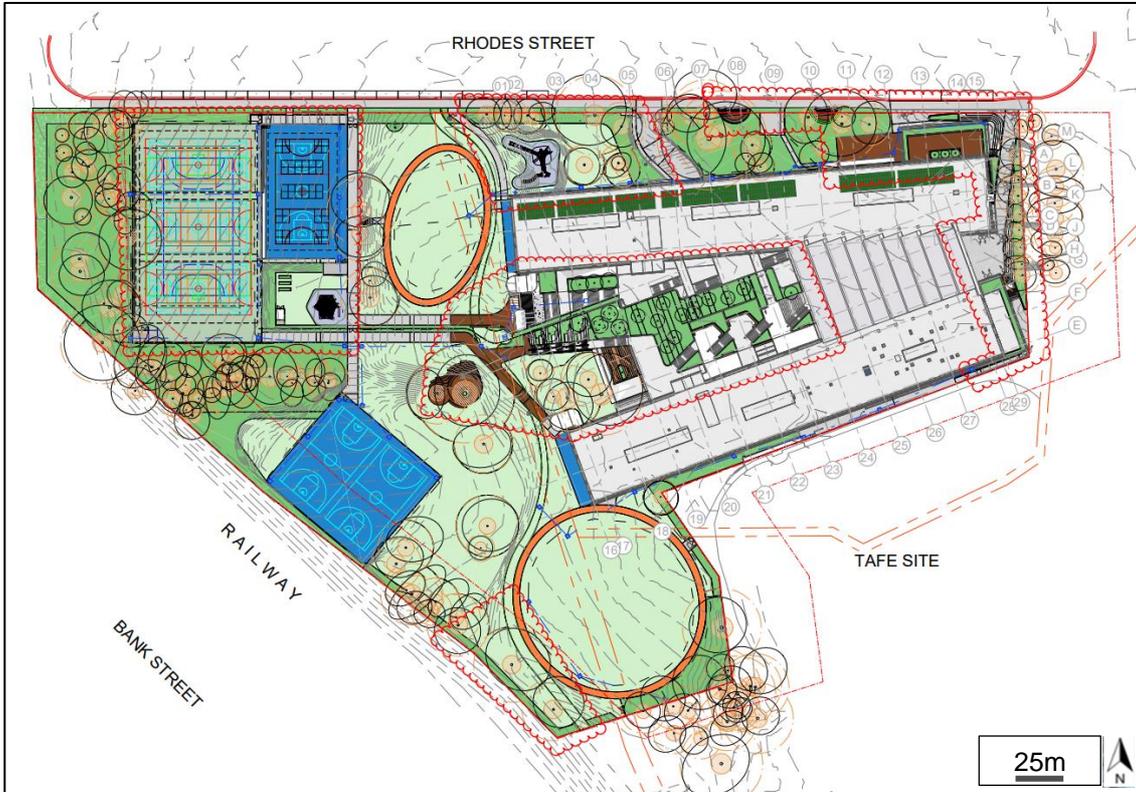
Proposed landscaping site plan (Source: Applicant's Modification Application 2020).
